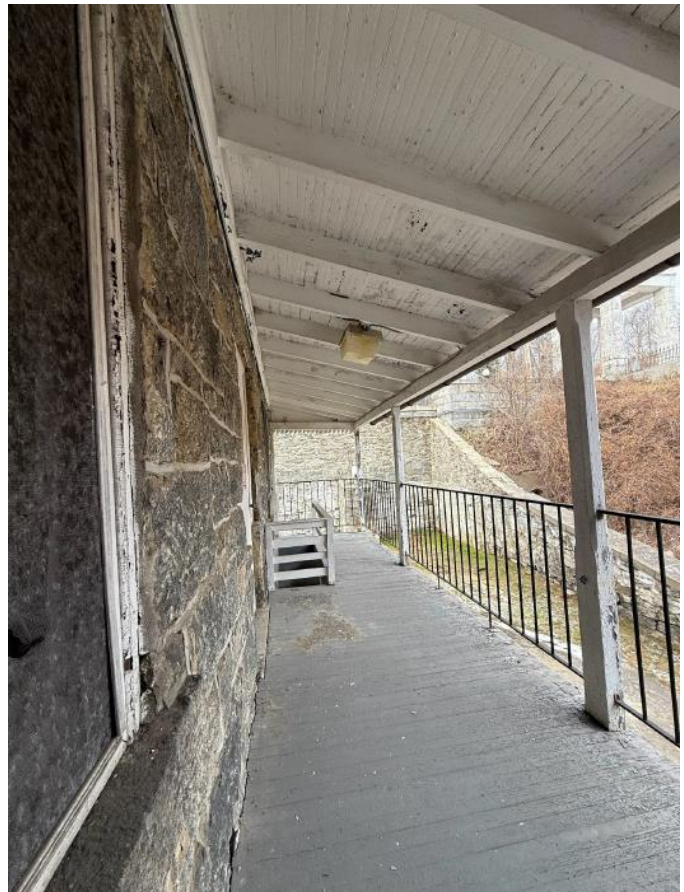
Image of second floor porch, stairway to be remove and infilled to match existing tongue and groove flooring.
